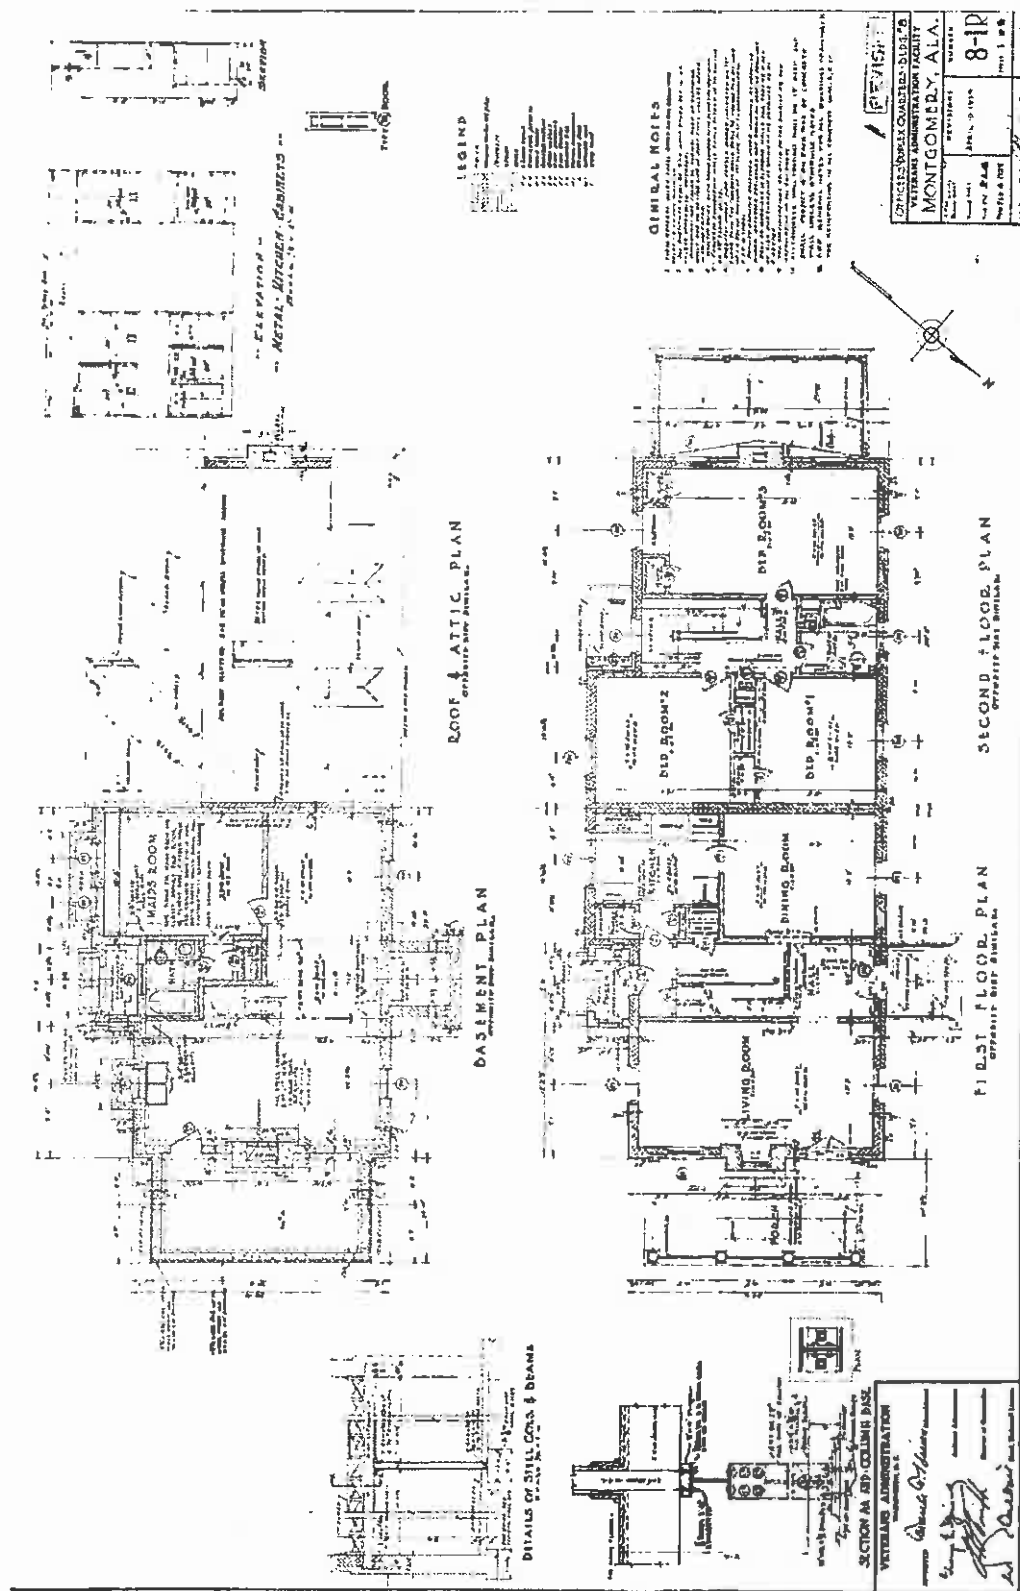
Floor Plans, Officers Duplex Quarters, Building 8, Veterans Administration, Montgomery, Alabama, 1939.
